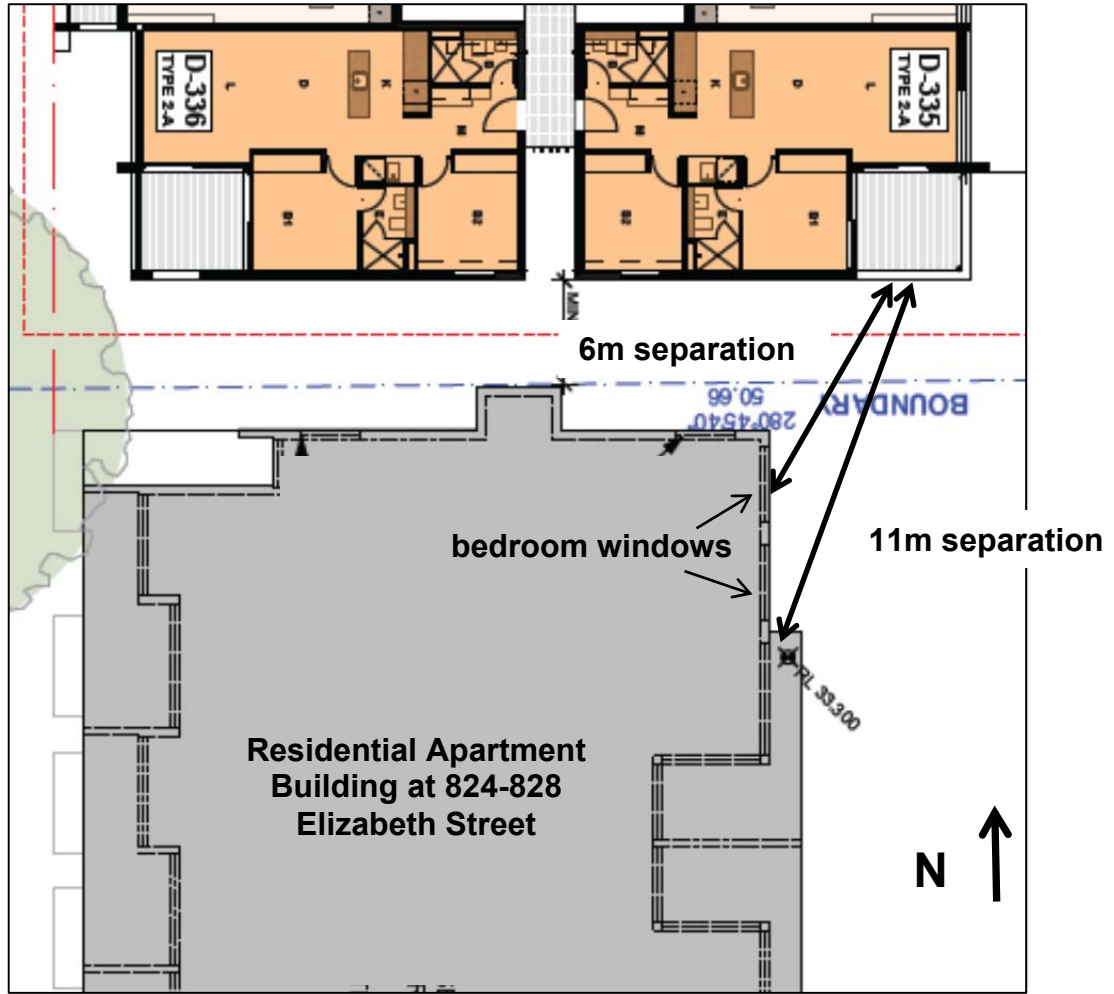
Separation distances between the balconies of the proposed development and the bedroom windows and balconies of the adjacent apartment building.
